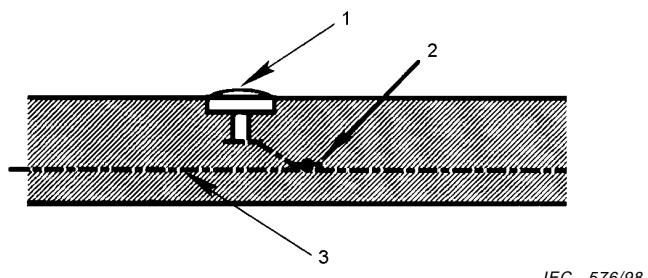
Construction of an external LPS on a structure of steel-reinforced concrete using the reinforcement of the structure outer walls as natural components
